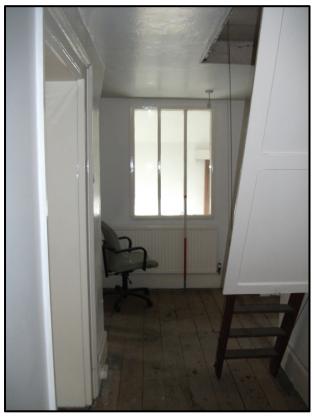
View of the First Floor, Front Hallway (F2). Looking north east
